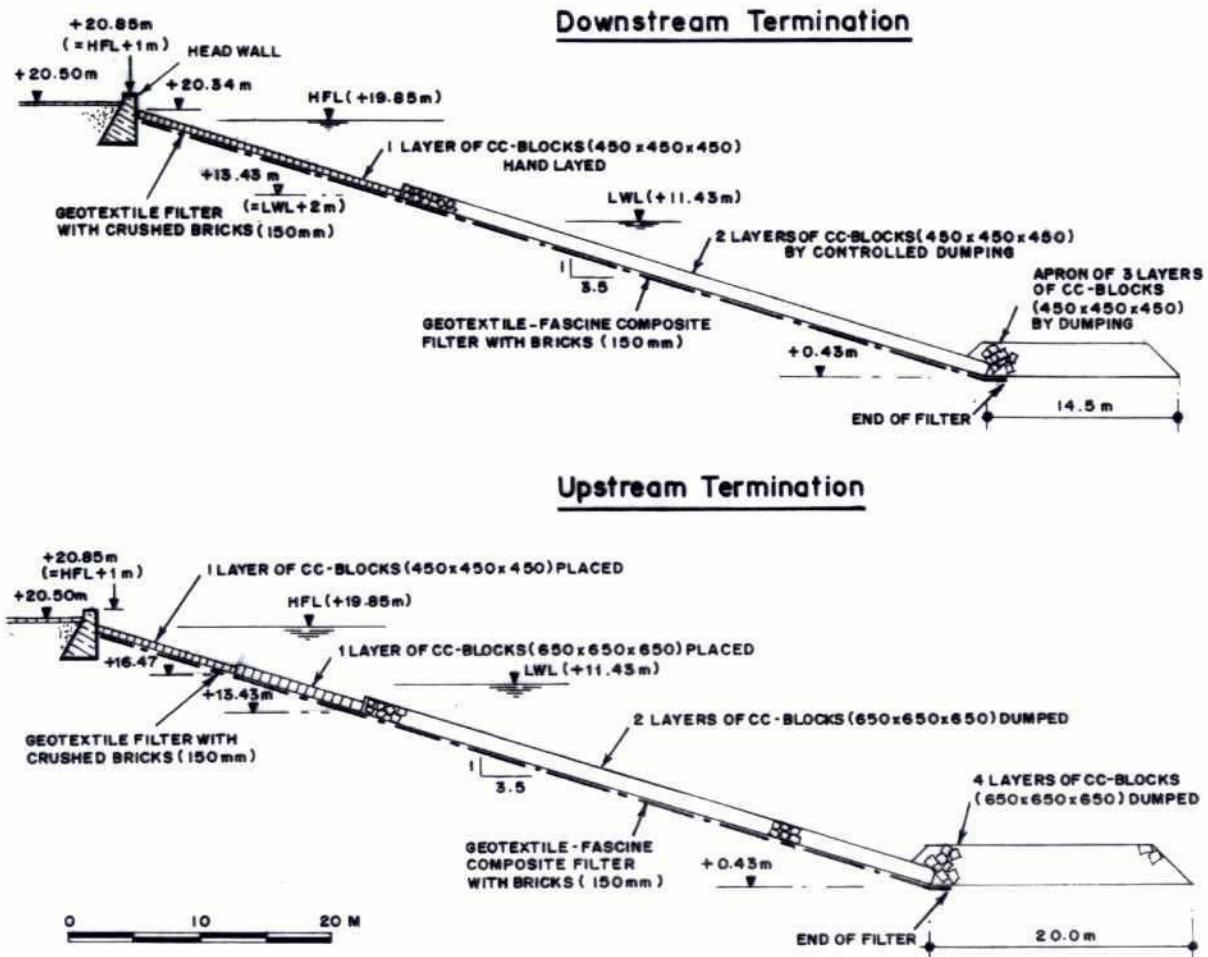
Typical cross sections of FAP 1 hard point No. 1 (Sirajganj)
